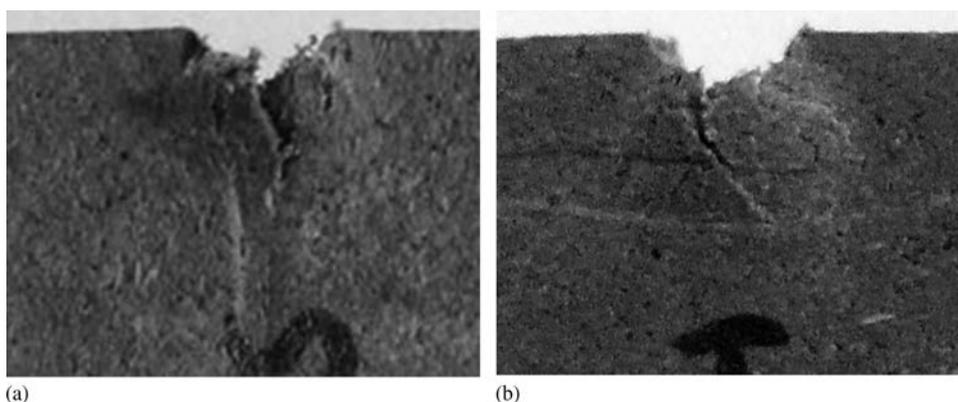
Typical failure modes observed in bolt-bearing tests in wood-plastic composite (WPCs): bearing load (a) parallel and (b) perpendicular to WPC extrusion direction.
